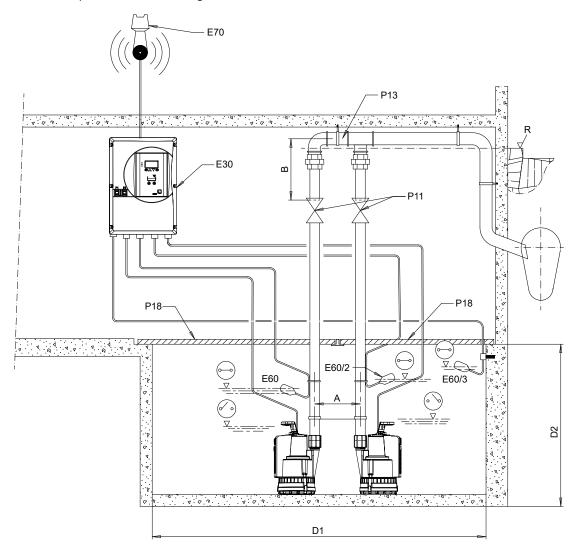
Installation example of an AmaDrainer 301, 303, 322 dual-pump station
